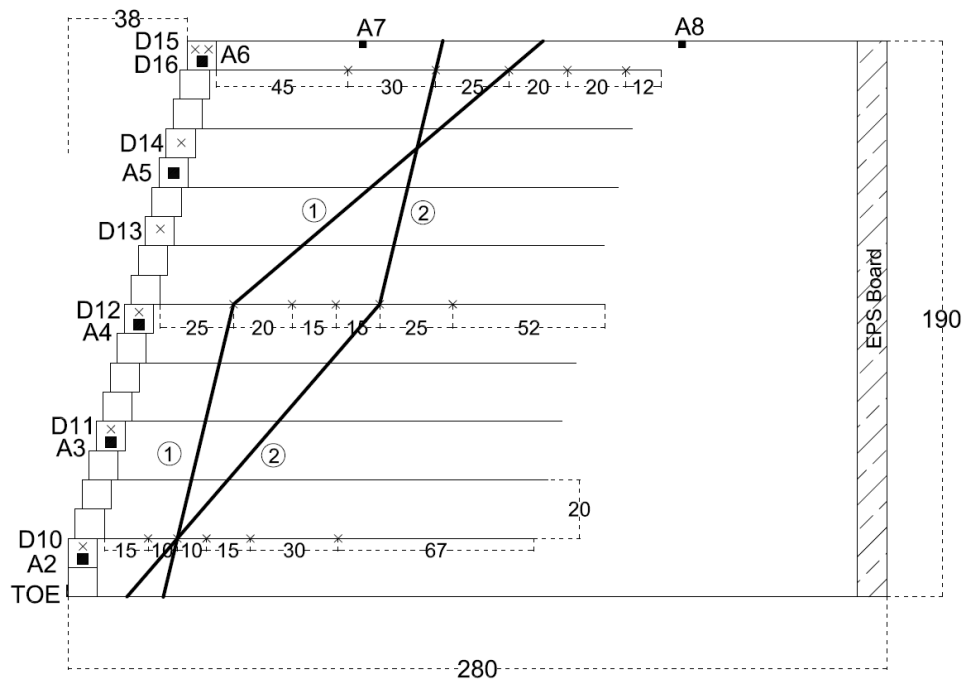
Potential Failure Planes for Setup 1 Kobe 50%.
